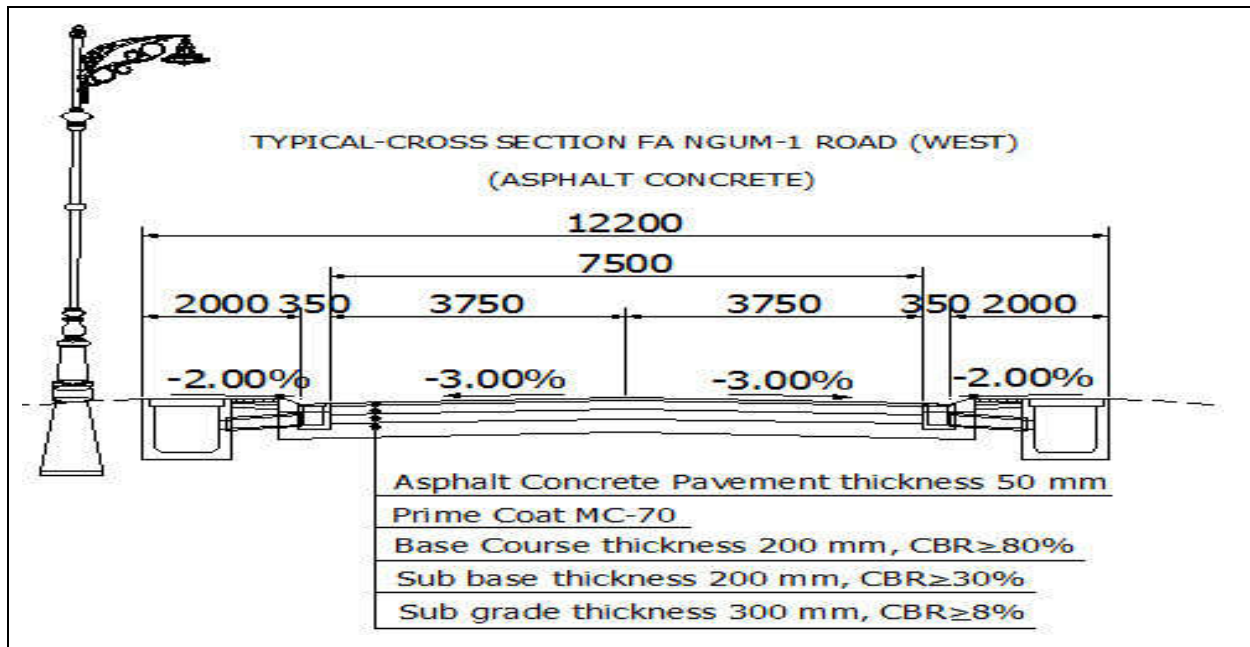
Typical cross-section of Fa Ngum-1 Road (West)
